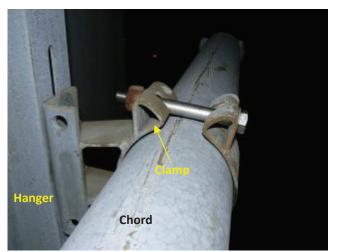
Dissimilar metals (stainless steel bolt and galvanized clamp) at hanger to chord connection clamp (two chord truss)
